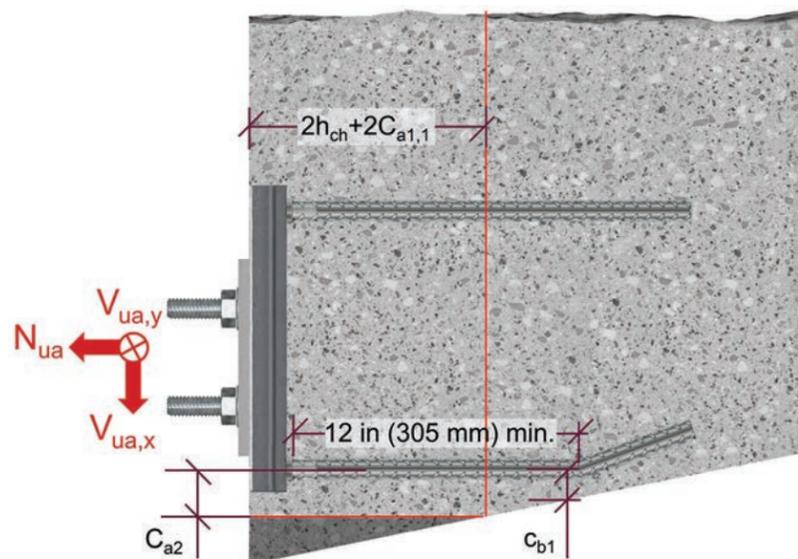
HAC CRFOS U — Single anchor channel — Acute angle Corner — Plan View.
